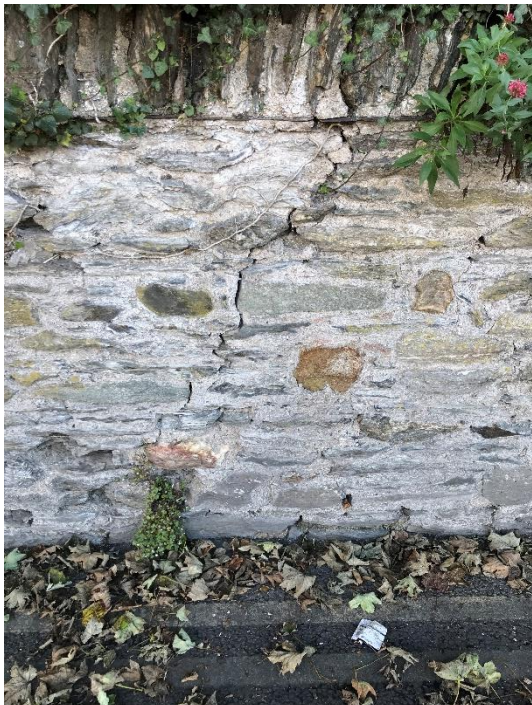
Reconstructed section of boundary wall to Wentworth Place
